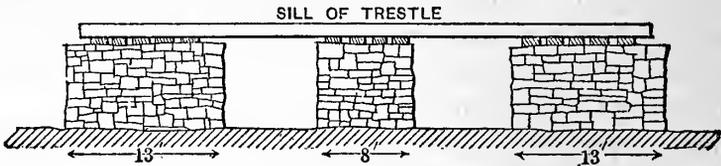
MASONRY TRESTLE FOUNDATION.
